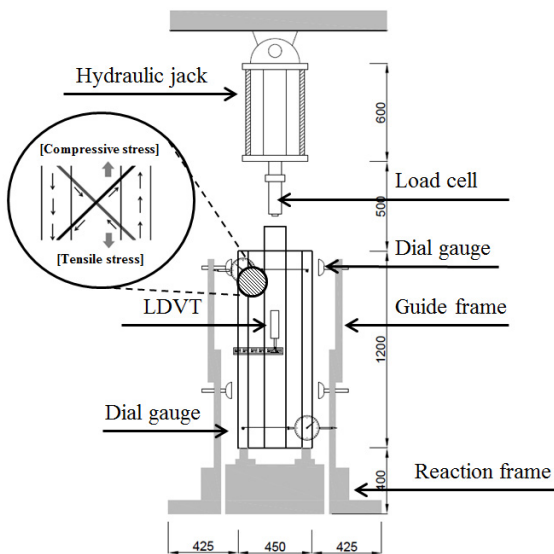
Set-up for in-plane shear loading (unit: mm)
